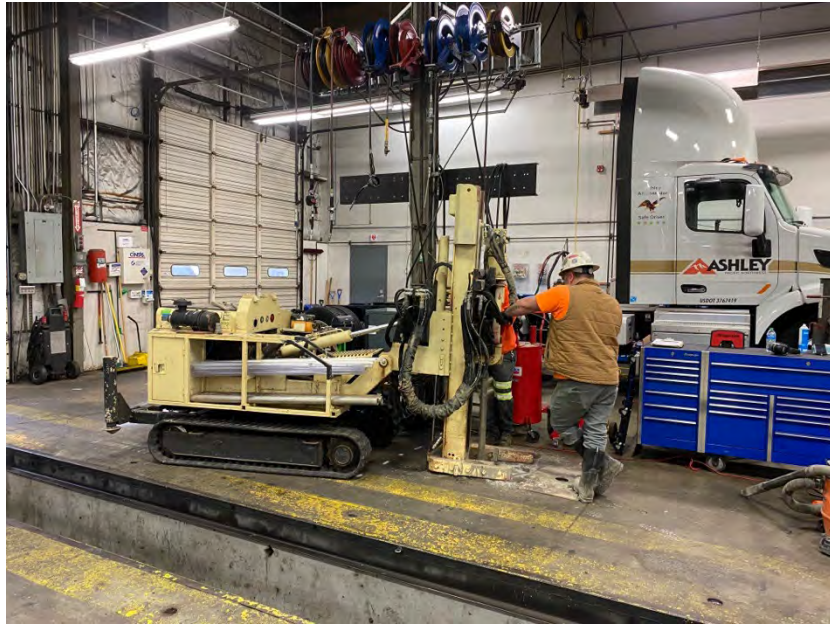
View south of drilling at the Boring B-19 location. Note I-beam roof column, directly behind the drill rig, which supports the current configuration of lubricant hose reels.
